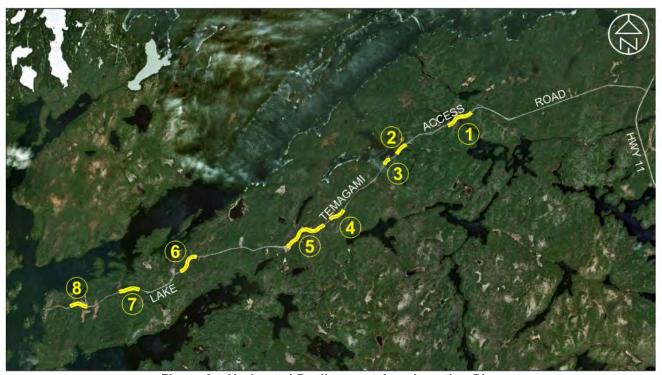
Horizontal Realignment Area Location Plan N.T.S.
